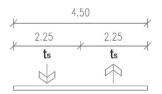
Geometrical cross-section of Partizanska street South [source: Author]
